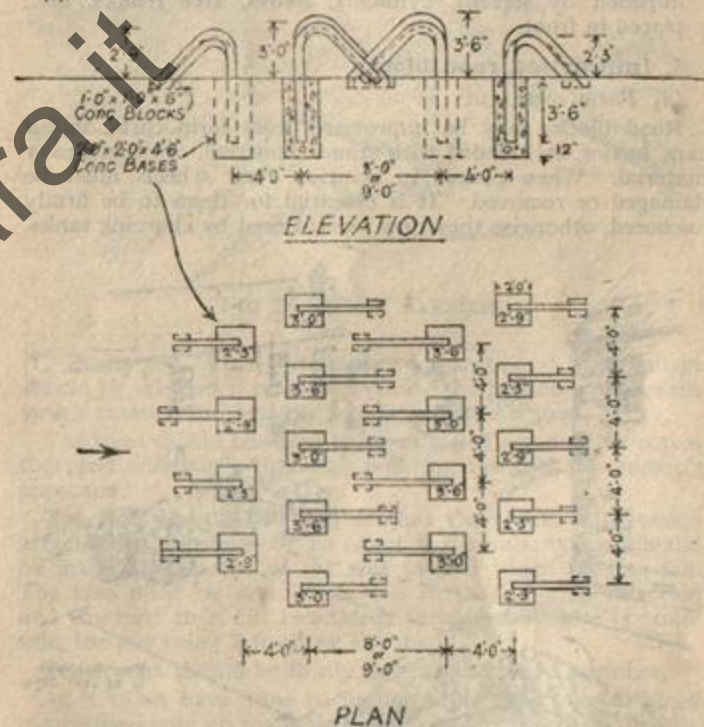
LAYOUT OF BENT RAIL OBSTACLE
